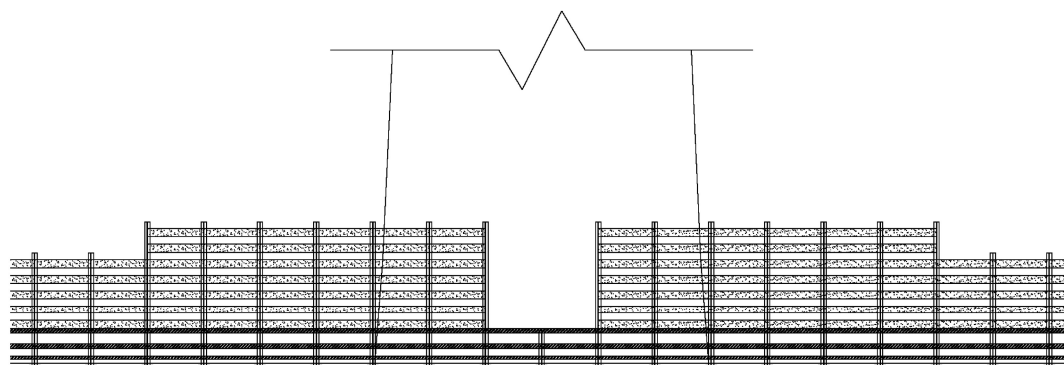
Arrangement of wind barriers at the tower section of Taizhou Yangtze River Bridge
